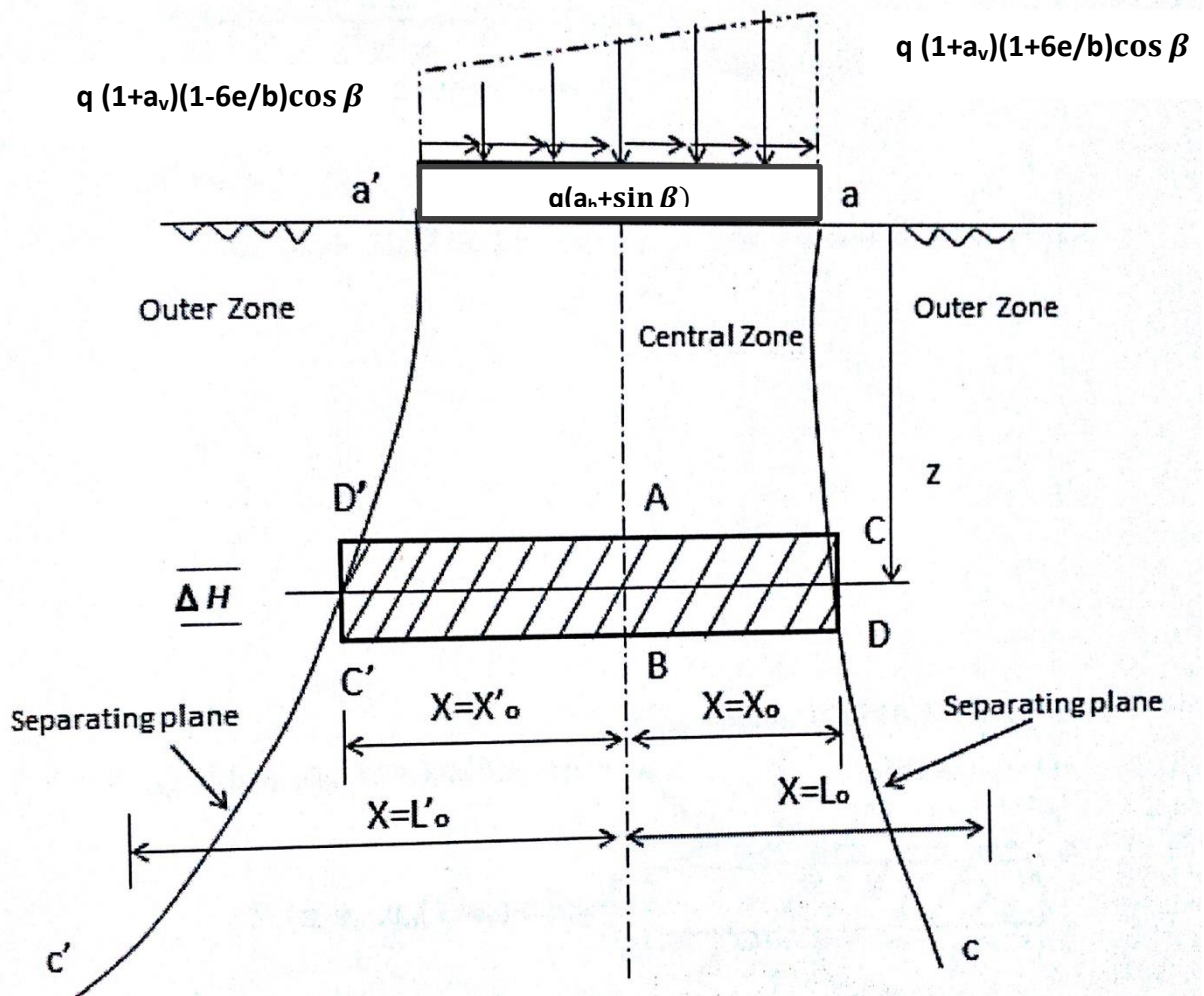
Failure plane on both side of strip footing(unsymmetrical)
